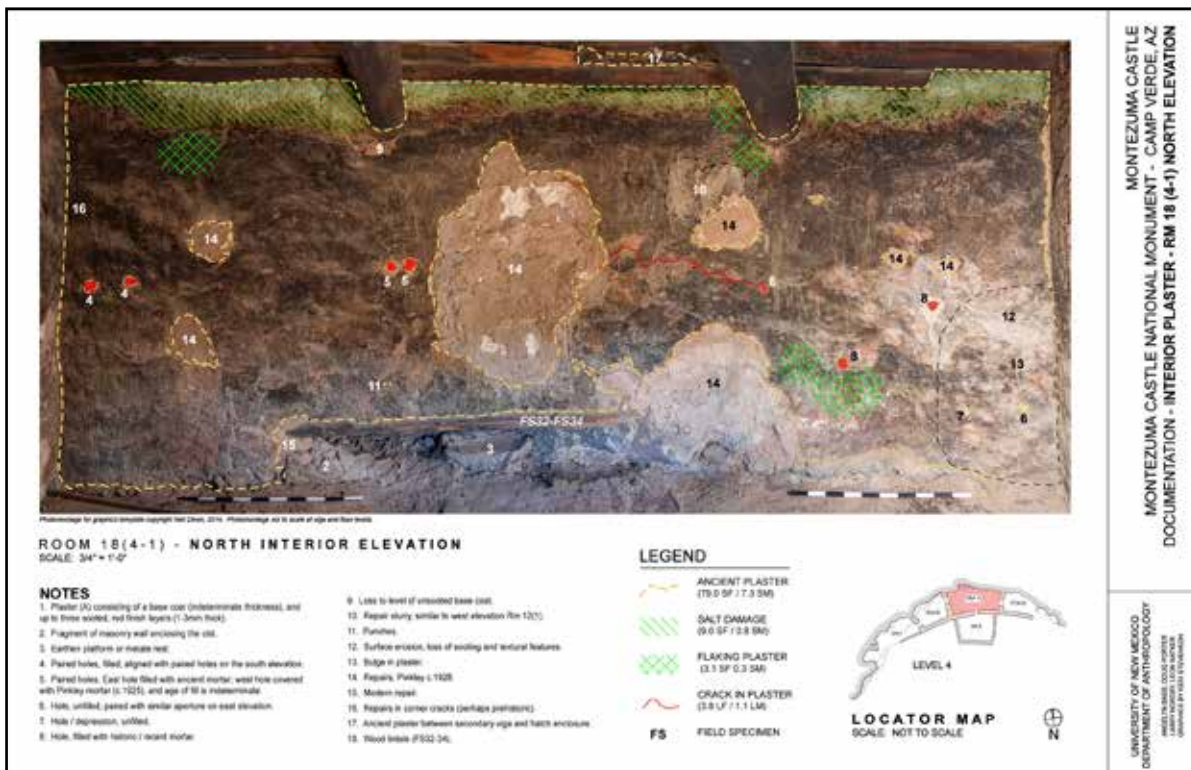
Annotated wall sheet for Room 18, Montezuma Castle cliff dwelling (Source: Bass et al. 2015:135).
